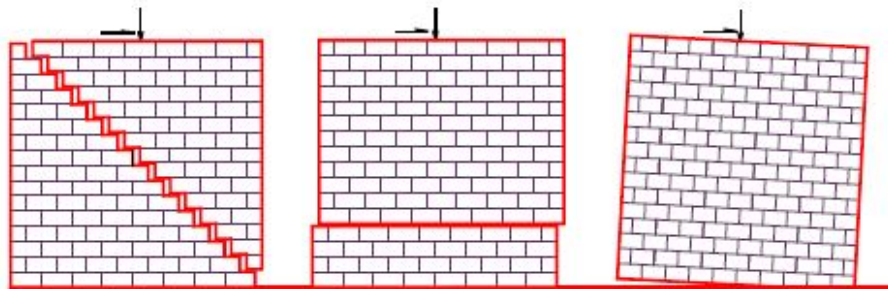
IN-PLANE FAILURE MECHANISMS- SHEAR FAILURE, SLIDING FAILURE, FLEXURAL FAILURE (ELGAWADY, BADOUX, AND LESTUZZI, 2006)
